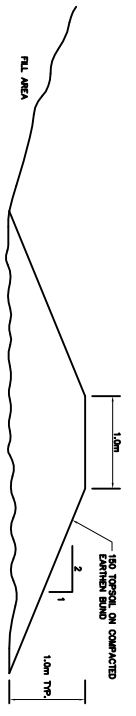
DETAILS OF SOILED WATER CONTAINMENT MEASURES
